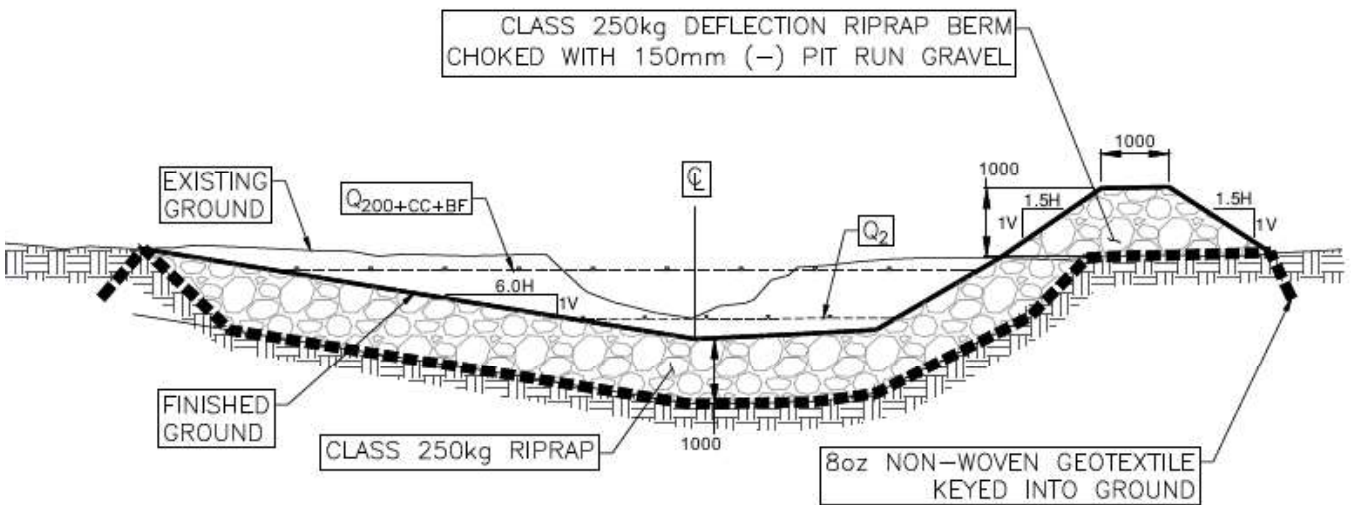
Sackum Creek Cross Section – Downstream of Access Road Crossing, Showing Deflection Berm
